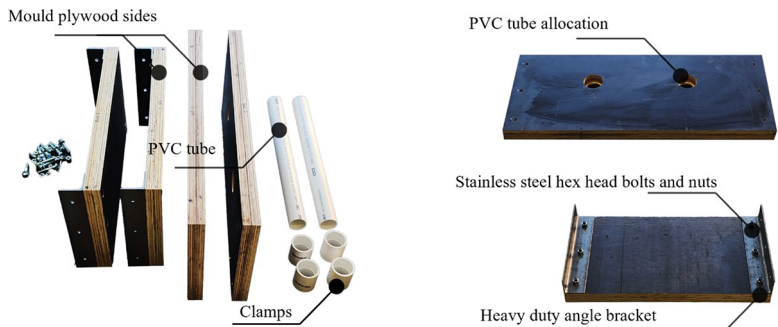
Formwork component assembly showing the main structural elements and tube positioning system
